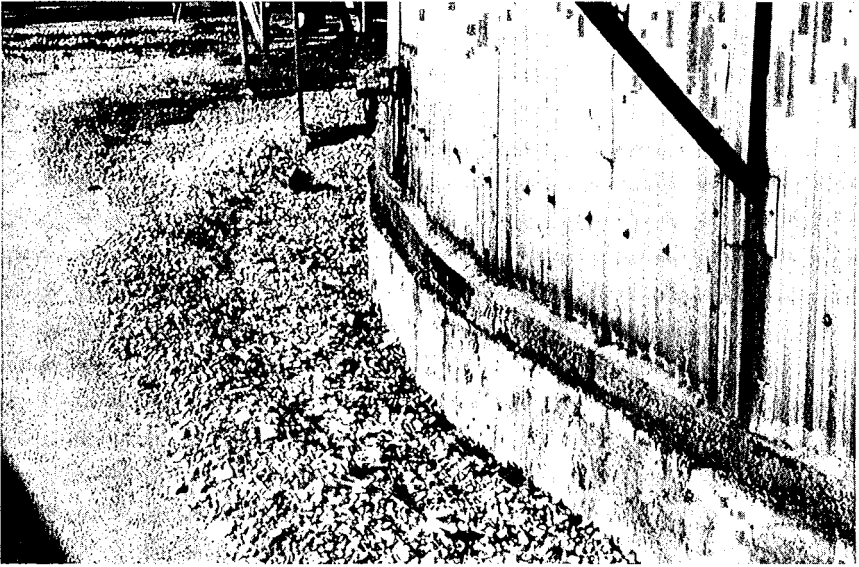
Foundation of a molten sulphur storage tank protected with SC
